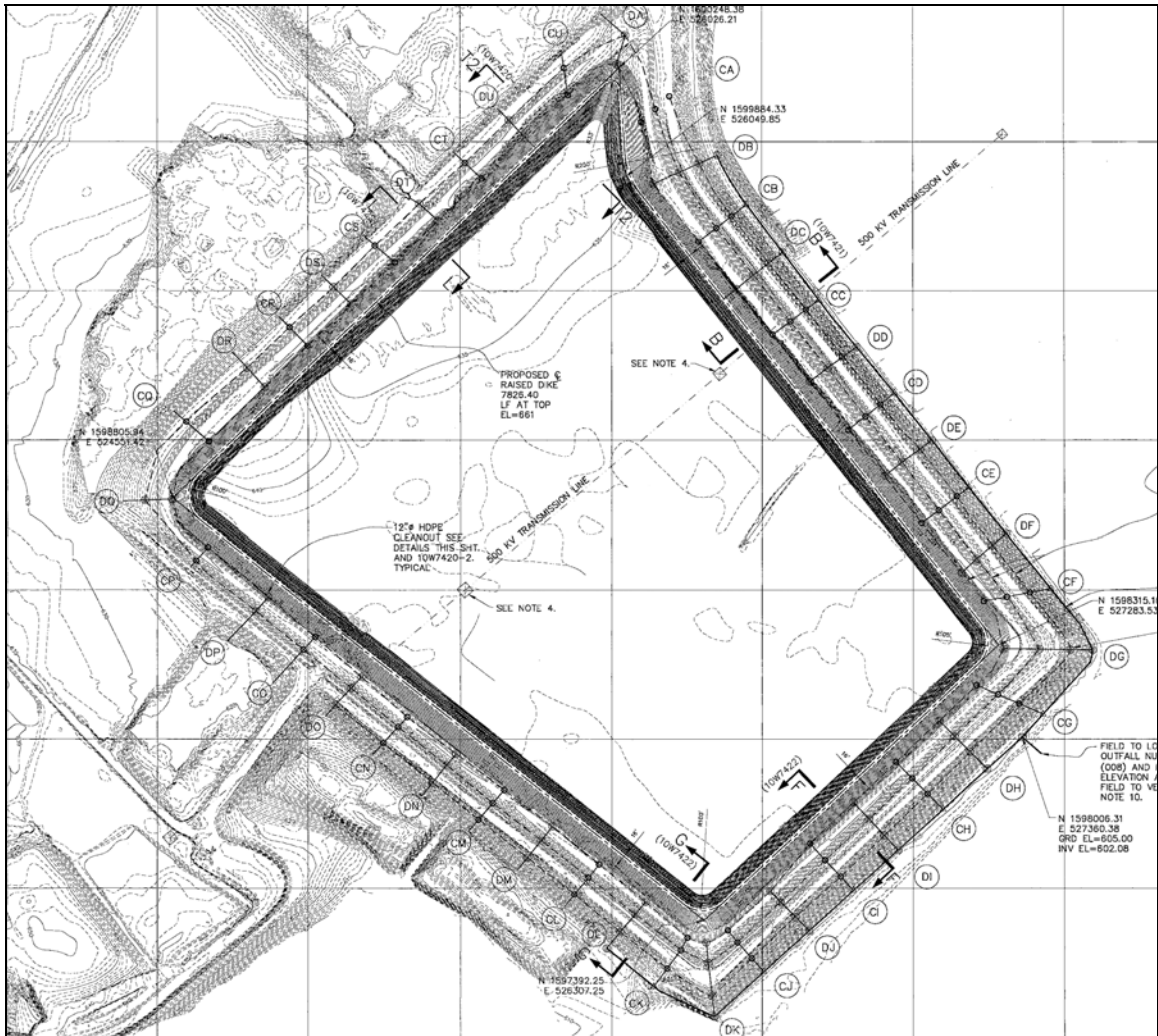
Scrubber Sludge Pond Underdrain Plan View
